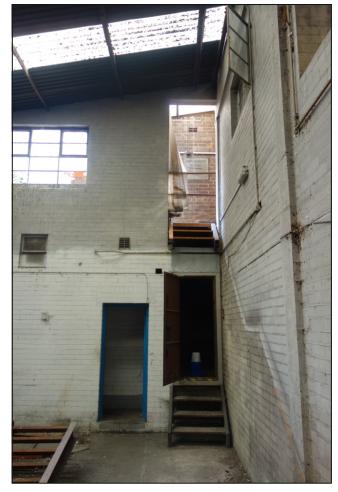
Detail of the south elevation and extension with dismantled staircase to the upper floor
